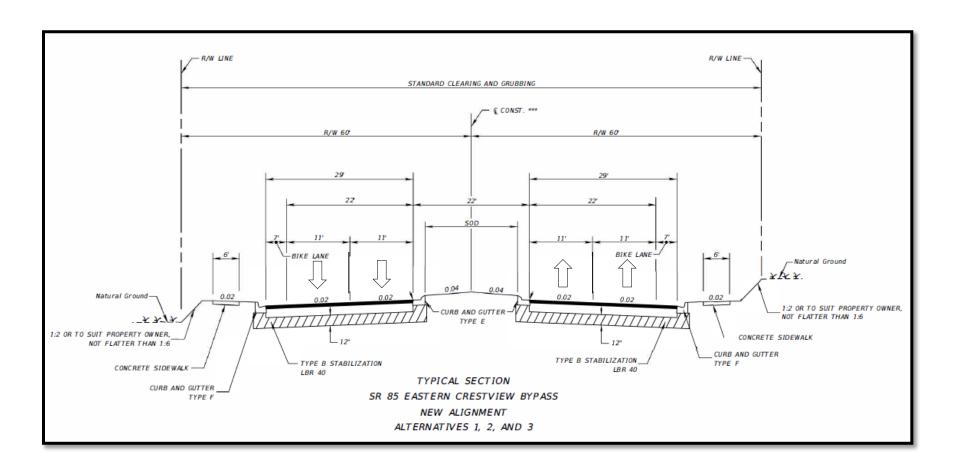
Build Alternative 4 Lane Preliminary Typical Section
